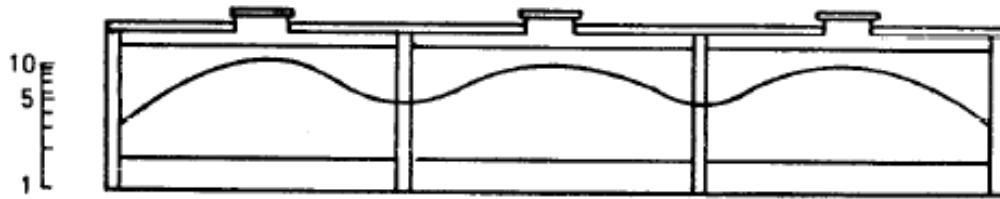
CONTINUOUS HORIZONTAL ROOF LIGHTS WITH DIFFUSED GLAZING
